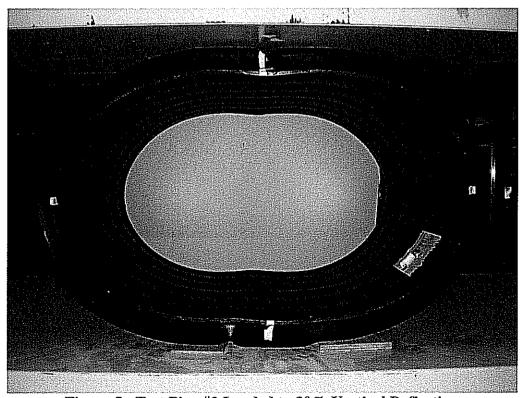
Test Pipe #2 Loaded to 30% Vertical Deflection
